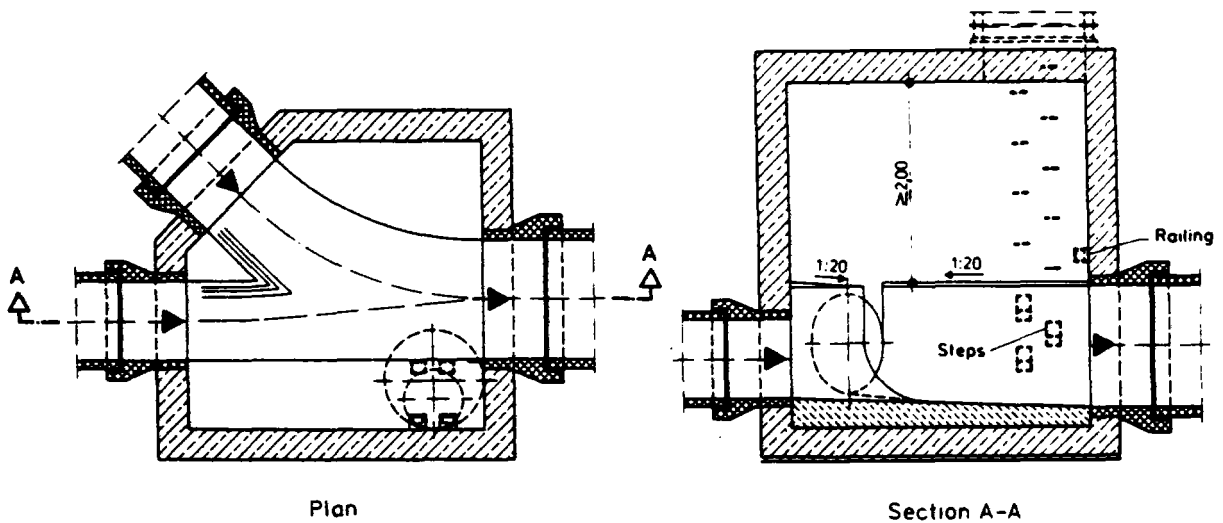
Sewer junction manhole layout (ATV, 1978)
